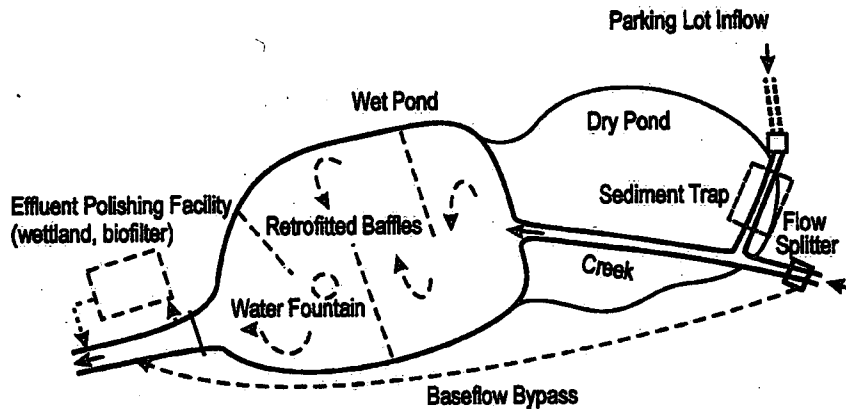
Kingston Stormwater Management Pond: Proposed Retrofit Measures
